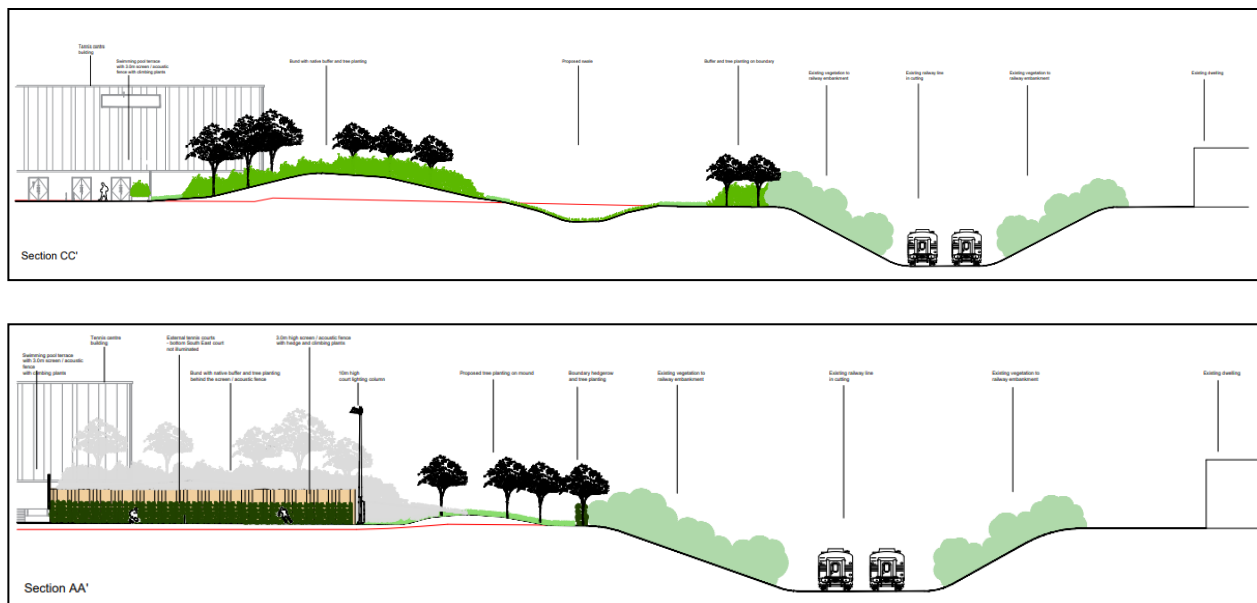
Cross Section Showing the Tennis Centre Building/Proposed Earth Works/Landscaping/Railway Cutting and Highwinds
